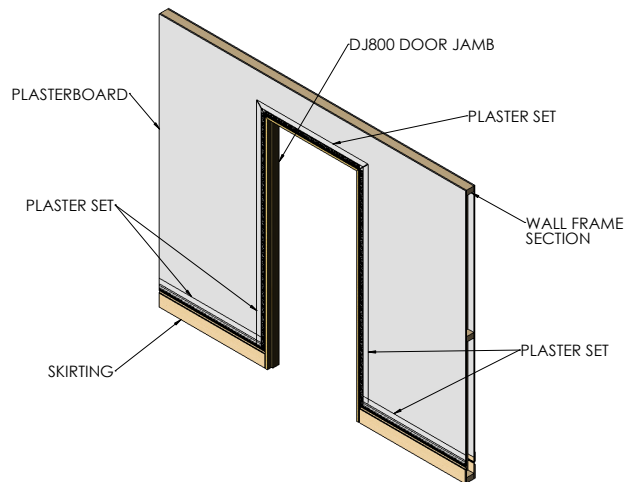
PLASTER SETTING OF DOOR JAMB & STOP BEAD INTERSECTION
